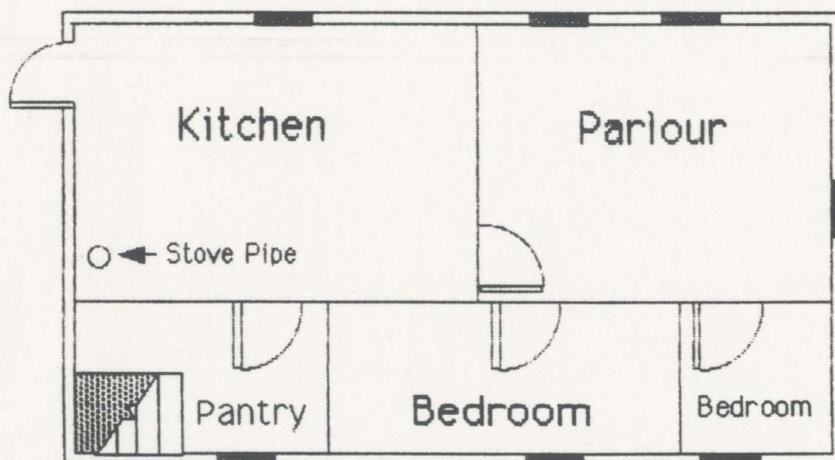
Floor plan, Cassell-McEachern log house, Alba,
